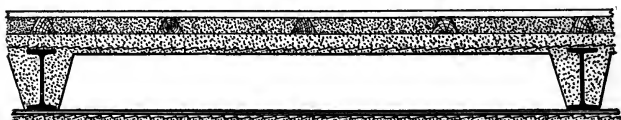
Expanded Metal Co.'s Floor with Suspended Ceiling.
